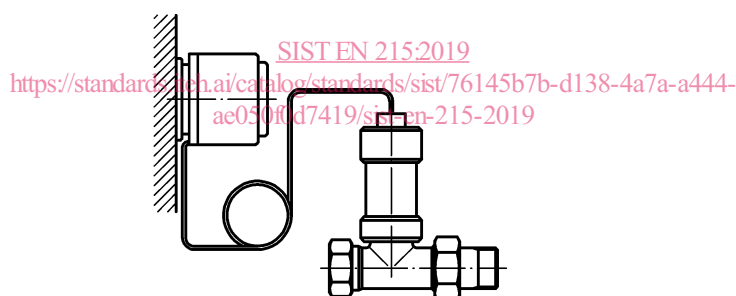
Thermostatic valve with the remote sensor incorporating the selector
